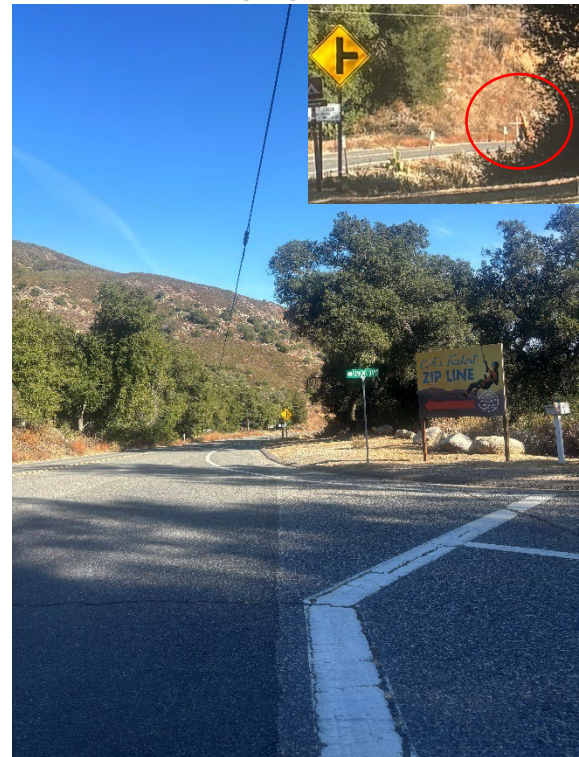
Corner Sight Distance at SR-76 & Campground Road
